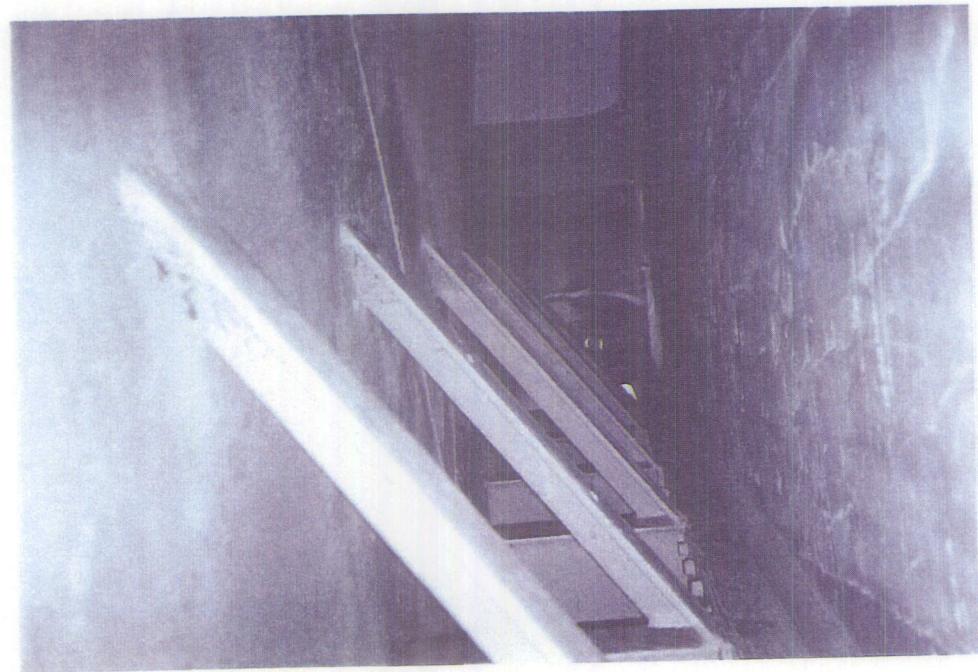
Morris Dam - 70' x 18' Drum Gate #2 - D/S side of gate chamber, looking towards left side of gate. Bracing on cantilevered portion of u/s faceplate.. - (9/10/98).
